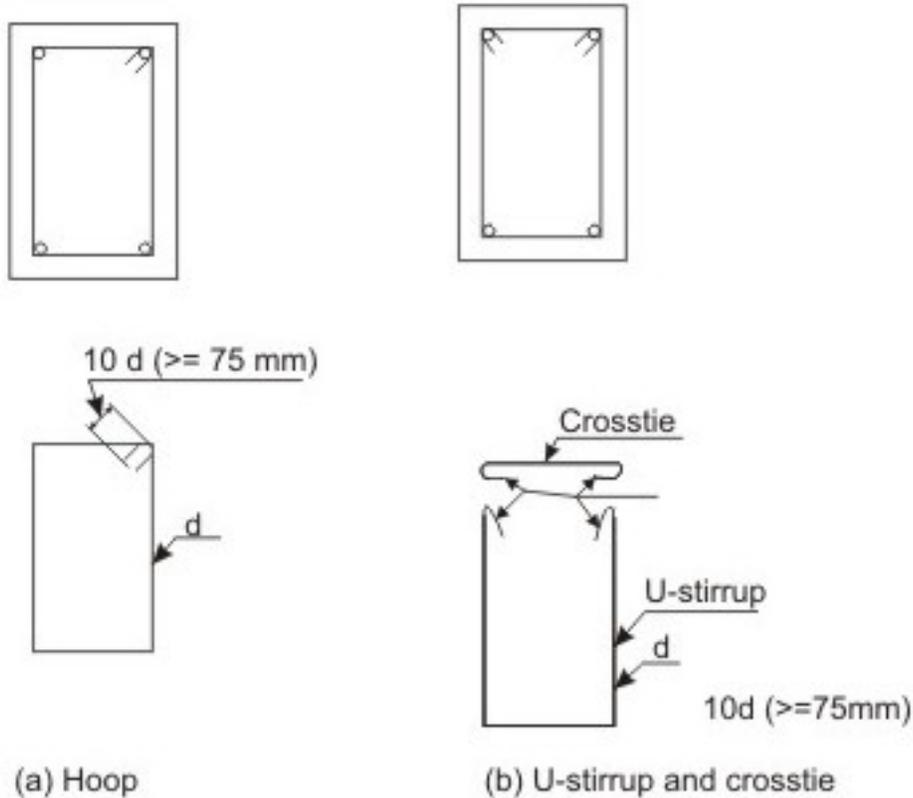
Hoop, and U-stirrup and crosstie
